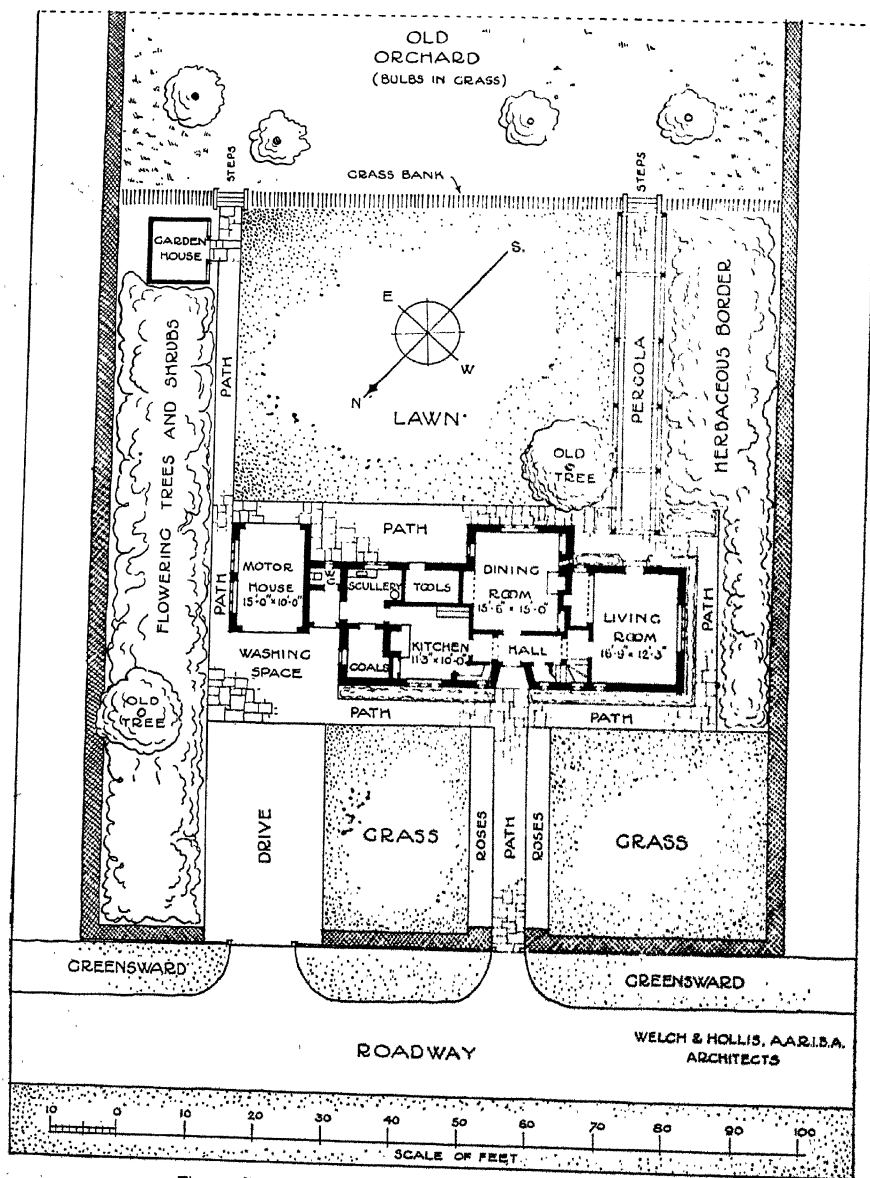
Ground Plan of House and Garden illustrated on opposite Plate
